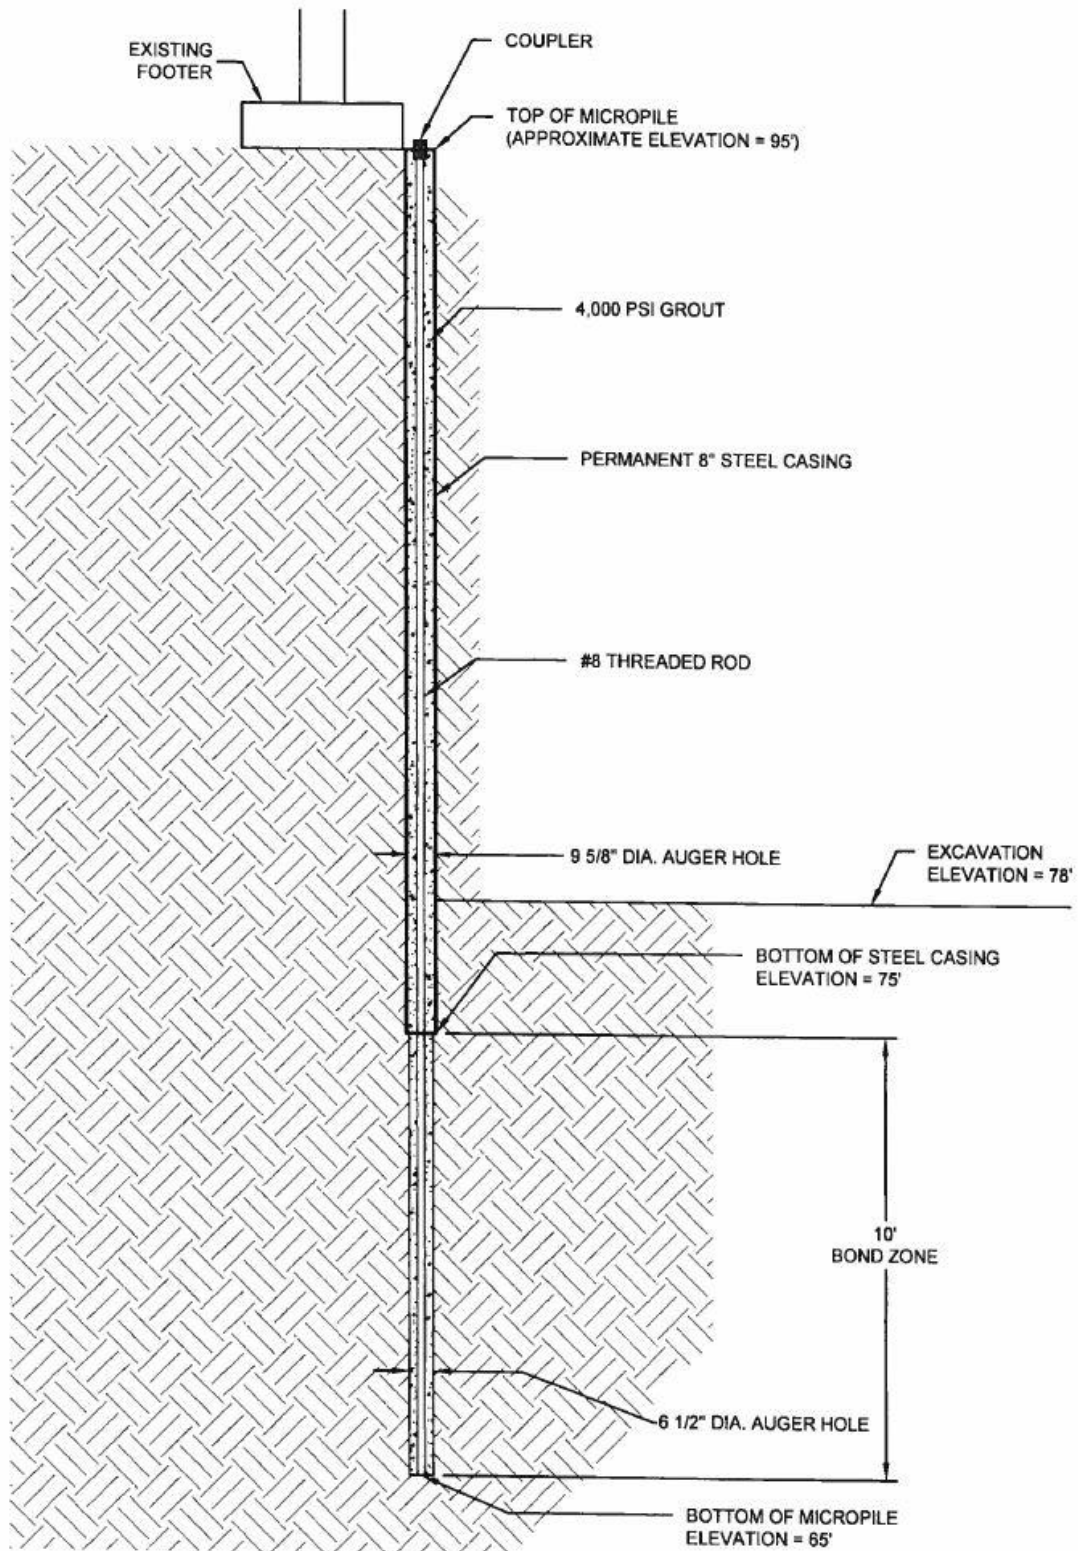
Typical underpinning of an existing foundation using micropiles for Hartwick College, New York.
